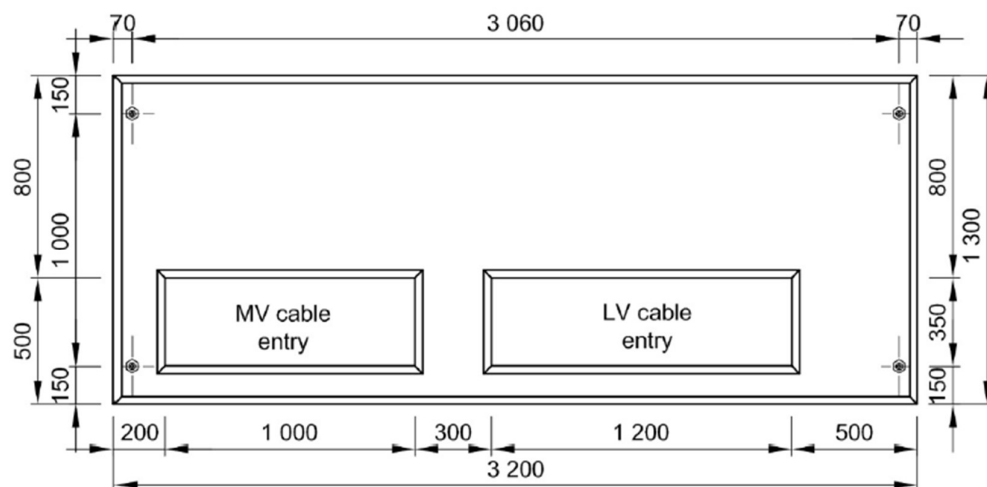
SANS 1029:2016 Type B MSS Plinth details: Plan view.
